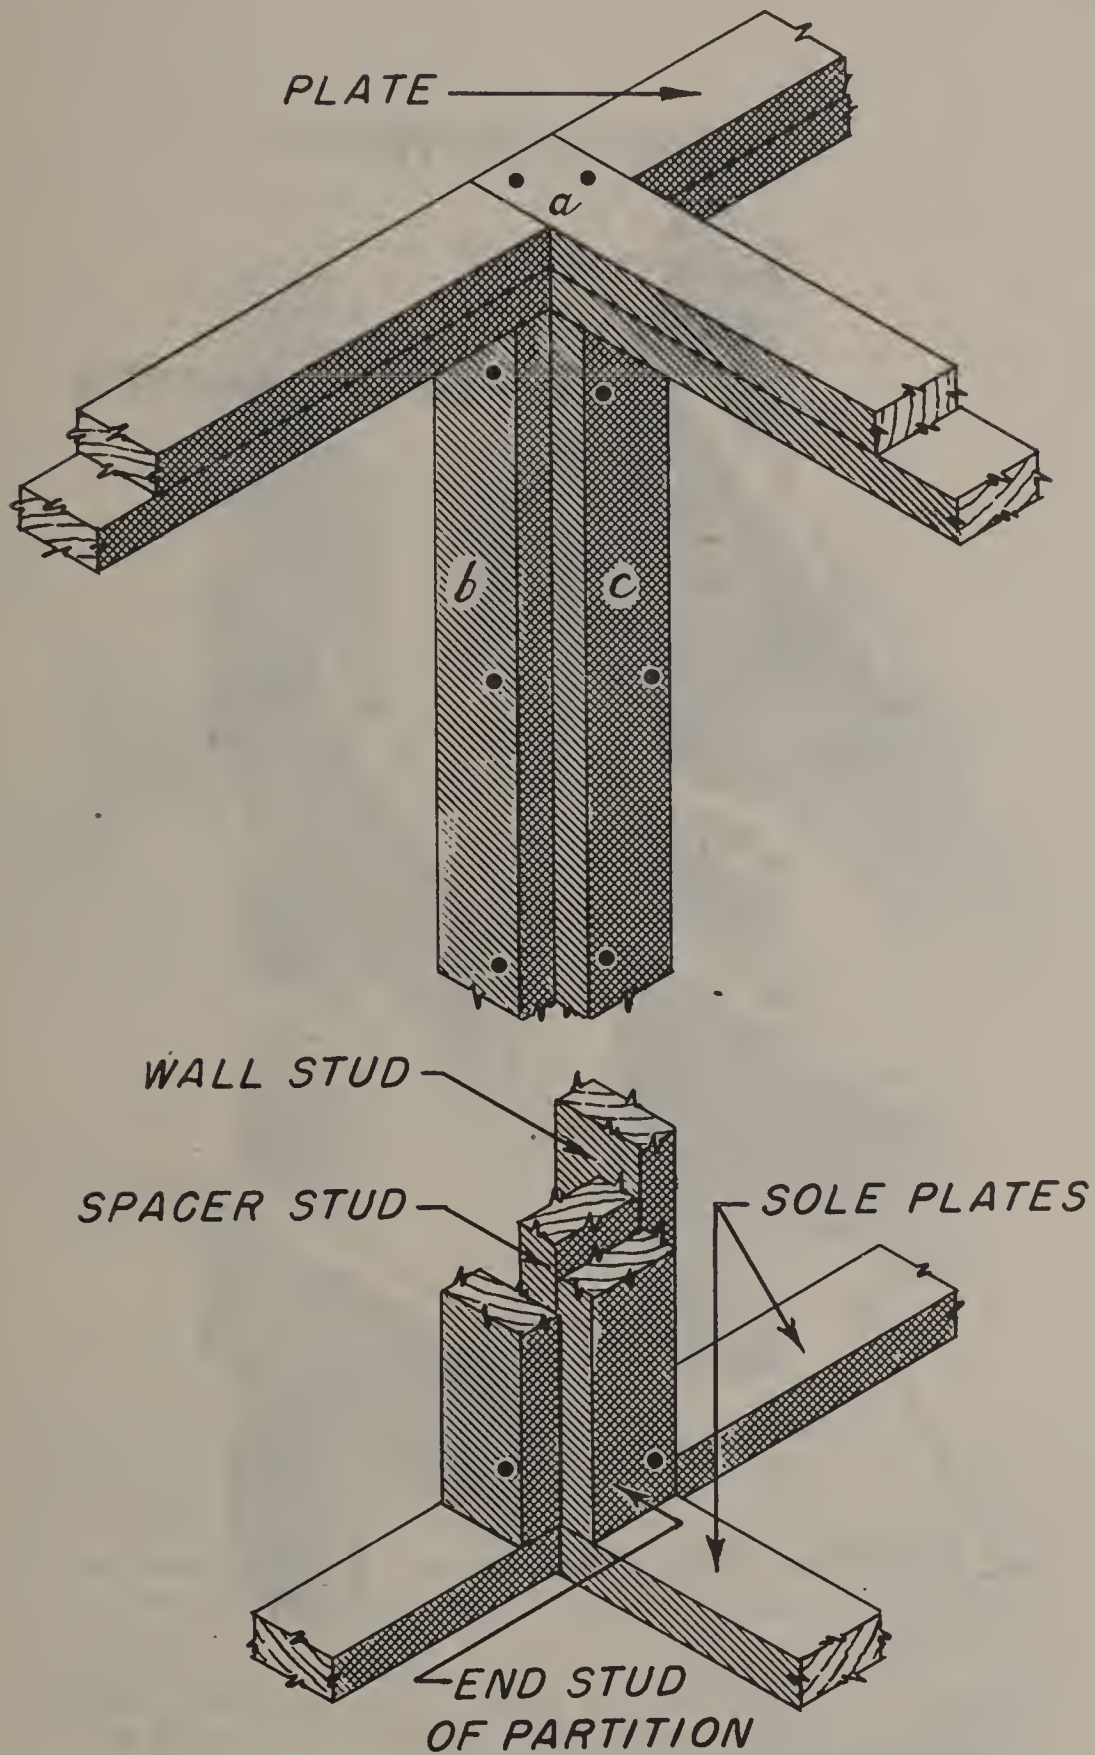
Connection of partition to wall. *a*. Upper member of partition plate nailed to lower (continuous) member of wall plate with two sixteenpenny nails. *b*. Wall studs nailed to spacer stud with sixteenpenny nails 12 inches on centers. *c*. End stud of partition nailed to spacer stud with tenpenny nails staggered with a vertical distance of 12 inches between nails.
